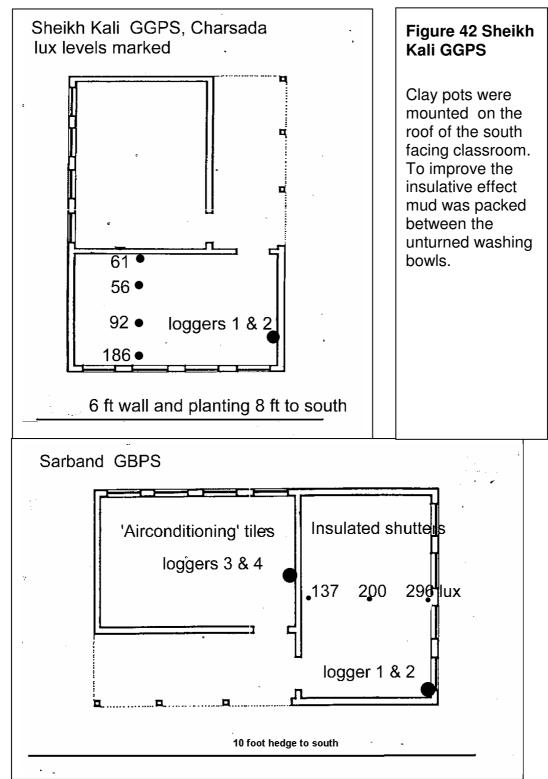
Sarband GBPS. The east facing classroom suffered glare and solar gain from the unobstructed east facing windows; insulated shutters improved situation and security.
